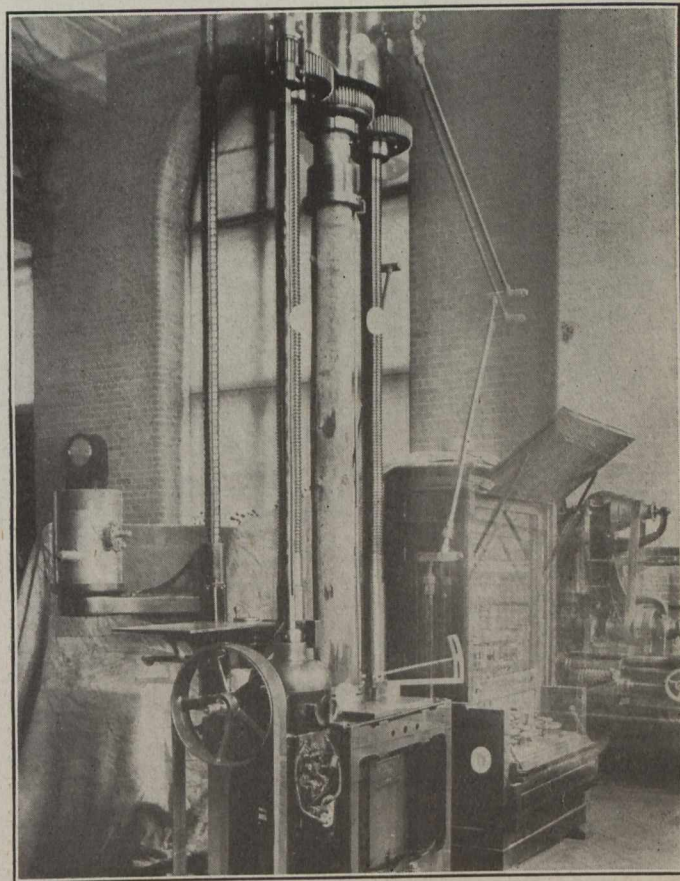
Emery Testing Machine Engaged on Mine Props.
